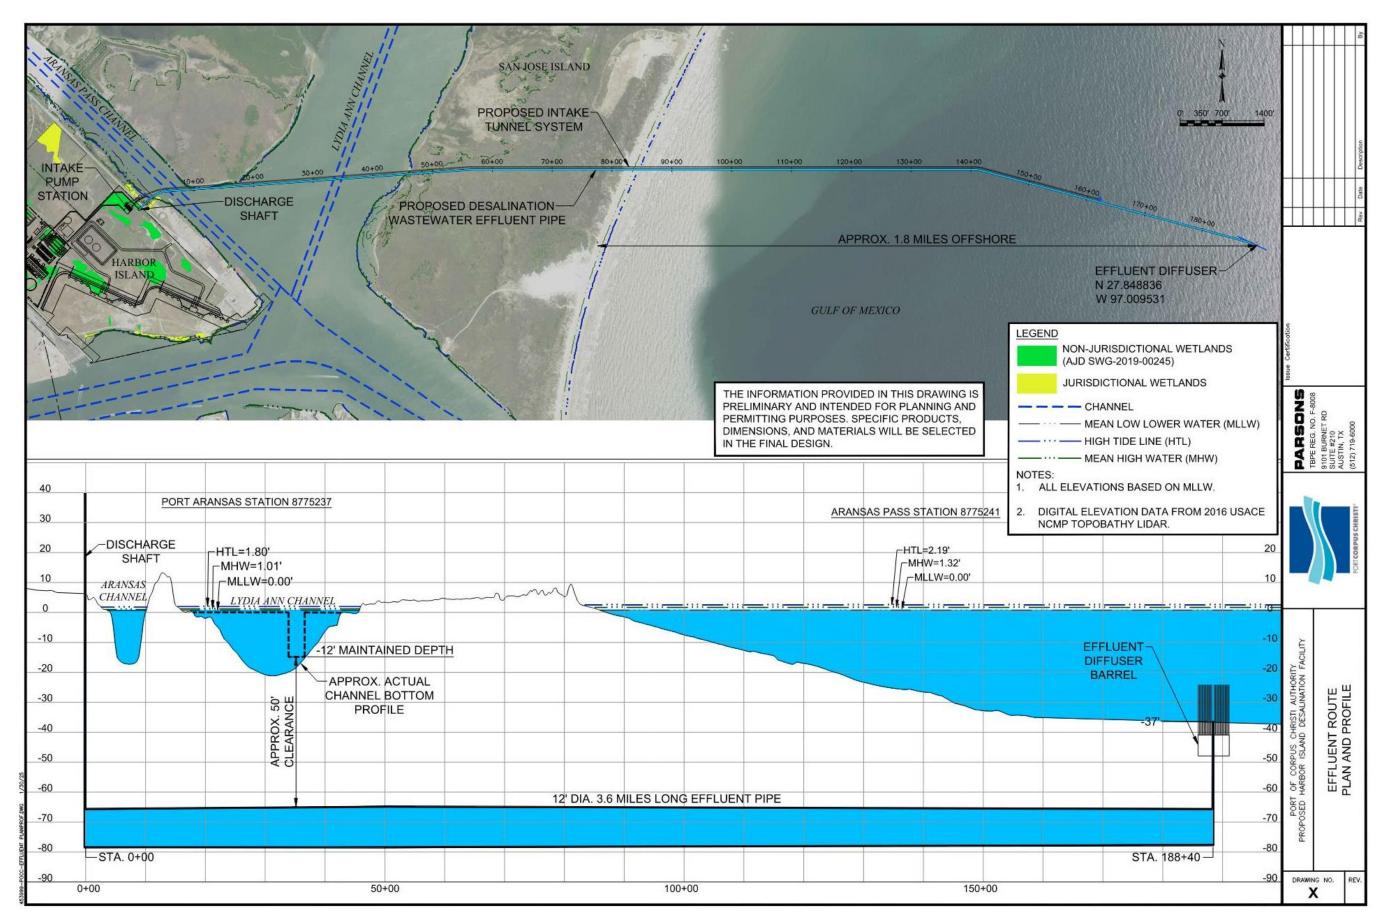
Plan and Profile of Proposed Discharge Tunnel
